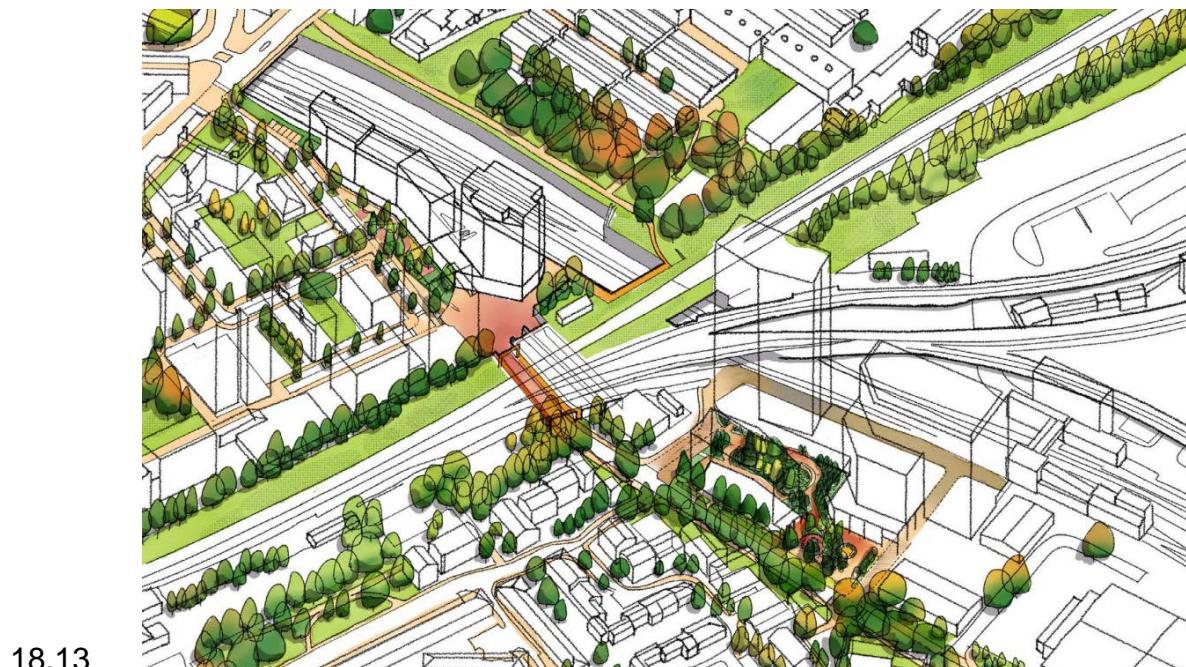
Illustrative plan showing Camley Street and Cedar Way landscaping proposals
